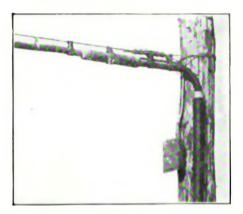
VIEW OF OVERHEAD CABLE, SHOWING MESSENGER STRAND.
